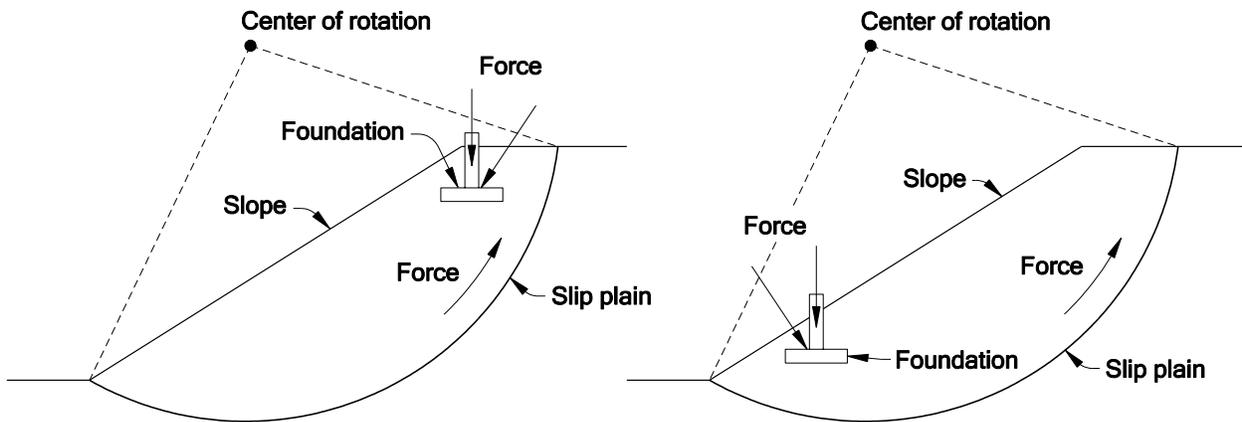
Example where footing contributes to instability of slope (left figure) vs. example where footing contributes to stability of slope (right figure)
